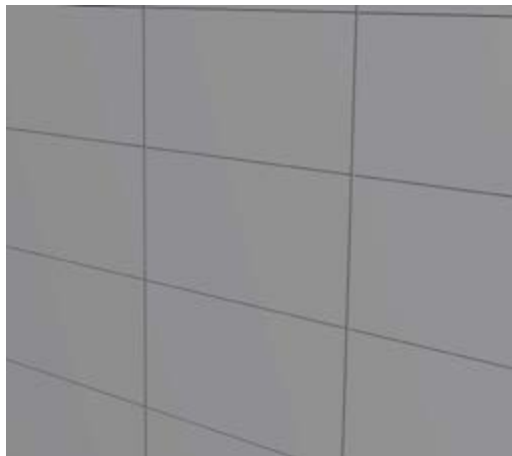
Facade element combination QO FB + B - Horizontal installation
